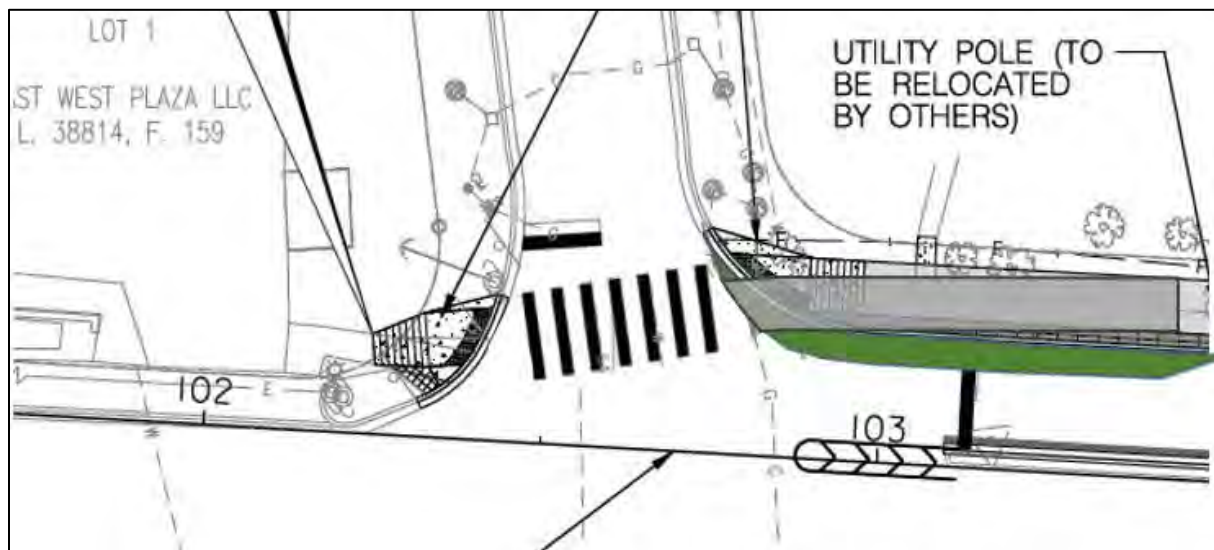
New Ave Bikeway at Auburn Avenue – Proposed Modifications
